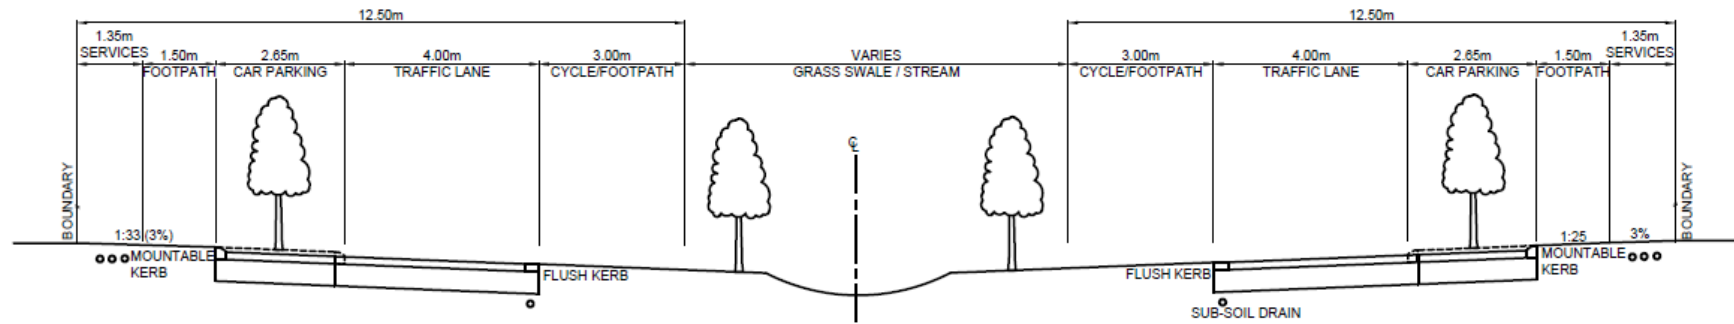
Te Kauwhata Structure Plan – road cross sections – local roads
